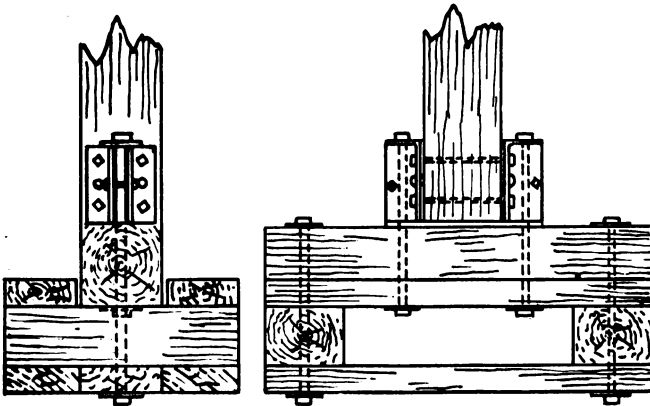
TYPE OF COLUMN-ANCHORAGE.
